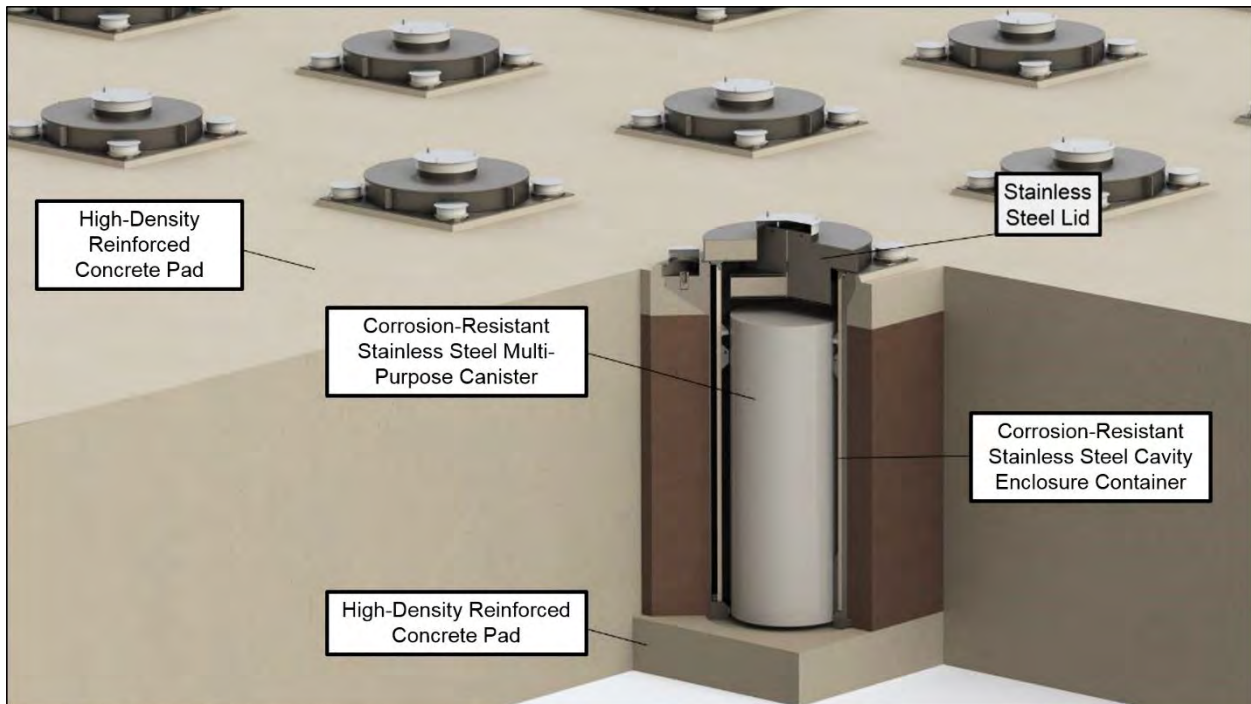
Illustration of a multi-purpose canister in a storage module supported by the concrete pad and surrounded by flowable grouting material.
